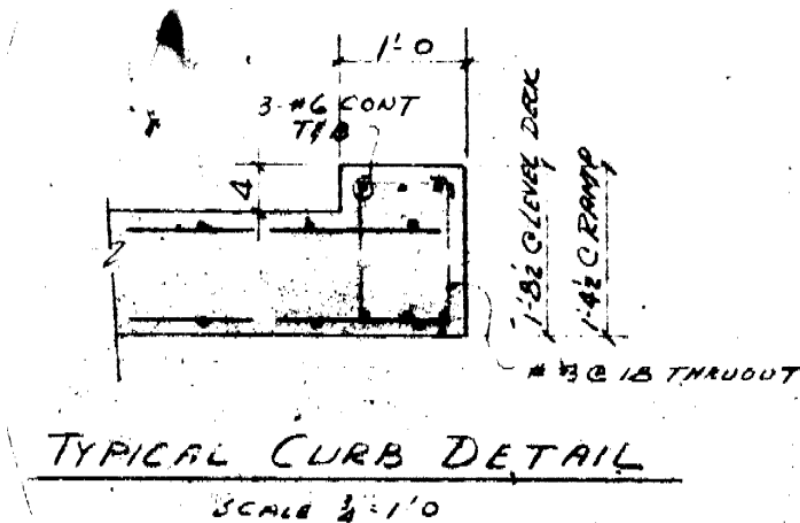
Typical curb detail (excerpt from the original design drawing S8)
